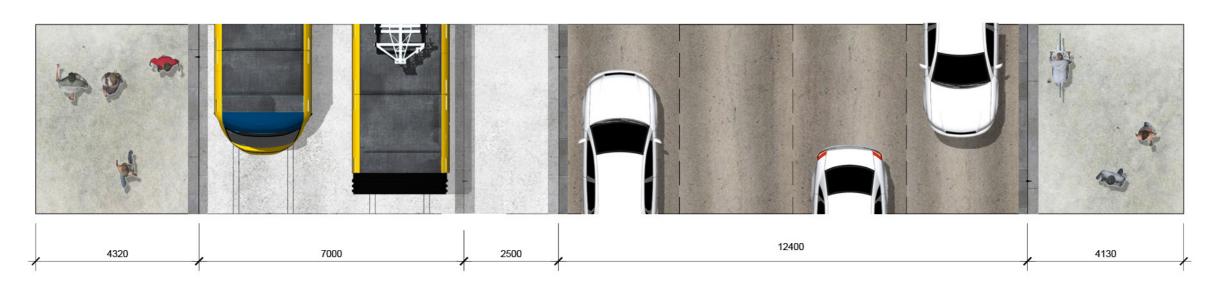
Partial plan and section of Customs Street West looking east towards Britomart
